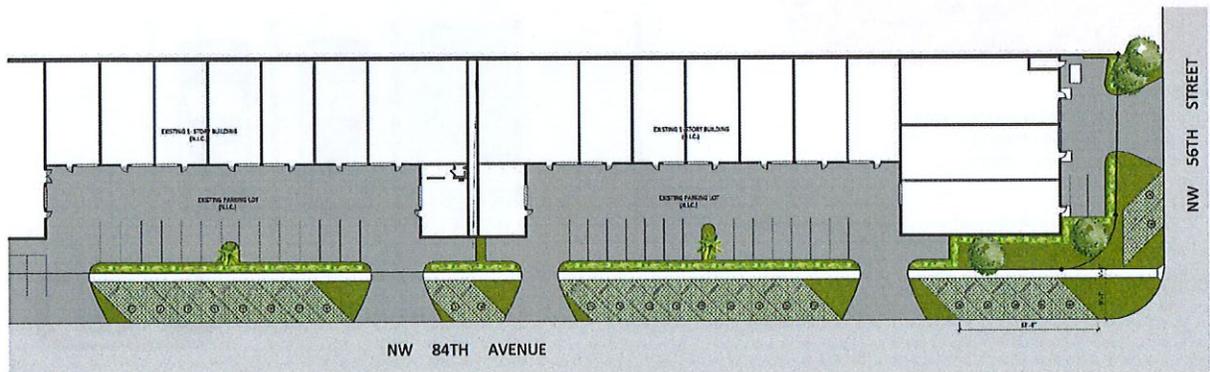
Proposed Parking Concept for 84th Avenue. Source: DNB Design Group.
